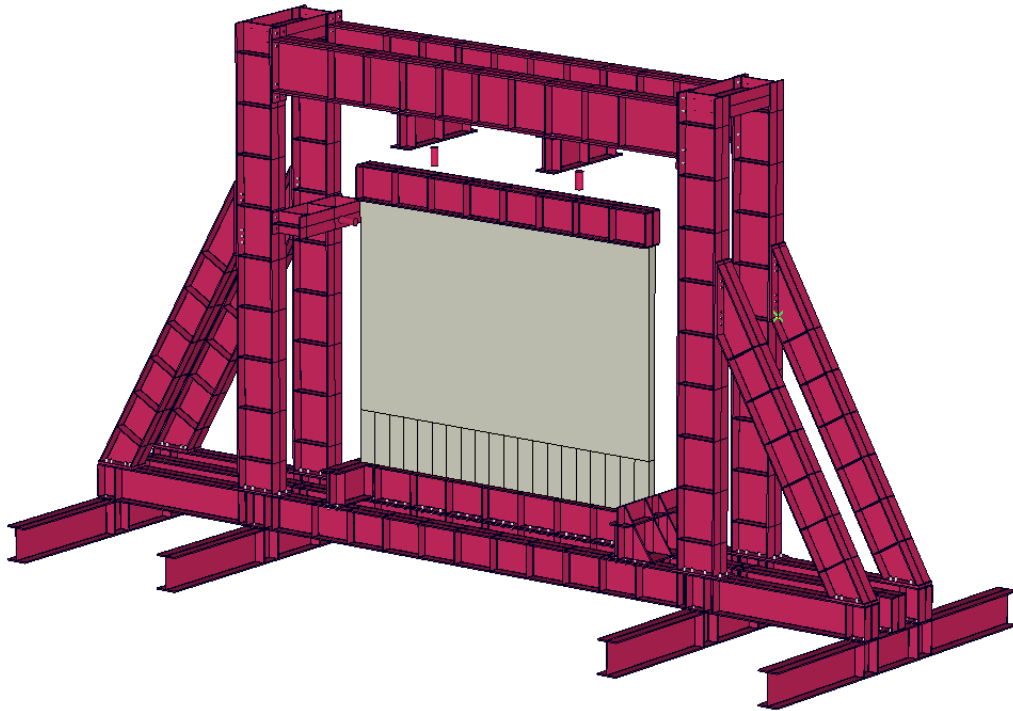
FEM model of the test frame: wall test (shell FE variant)
